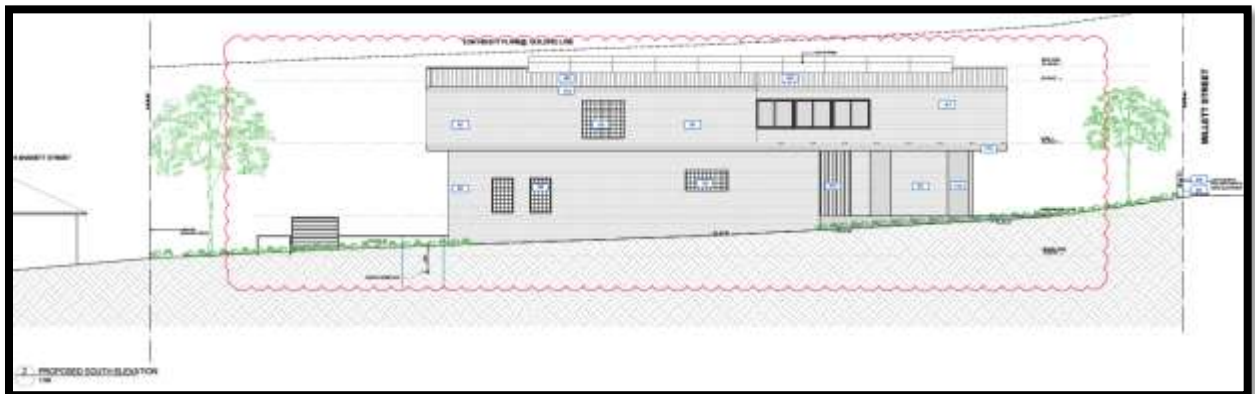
South east (side) Elevation at 5 Millett Street Hurstville (Source – Play Co Architects)
